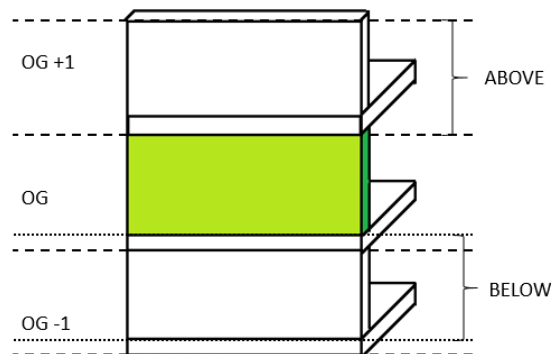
Elements filtered before distance checking: consider all walls and slabs one storey above the separating wall (green), the slabs and walls in the same storey and walls one storey below
